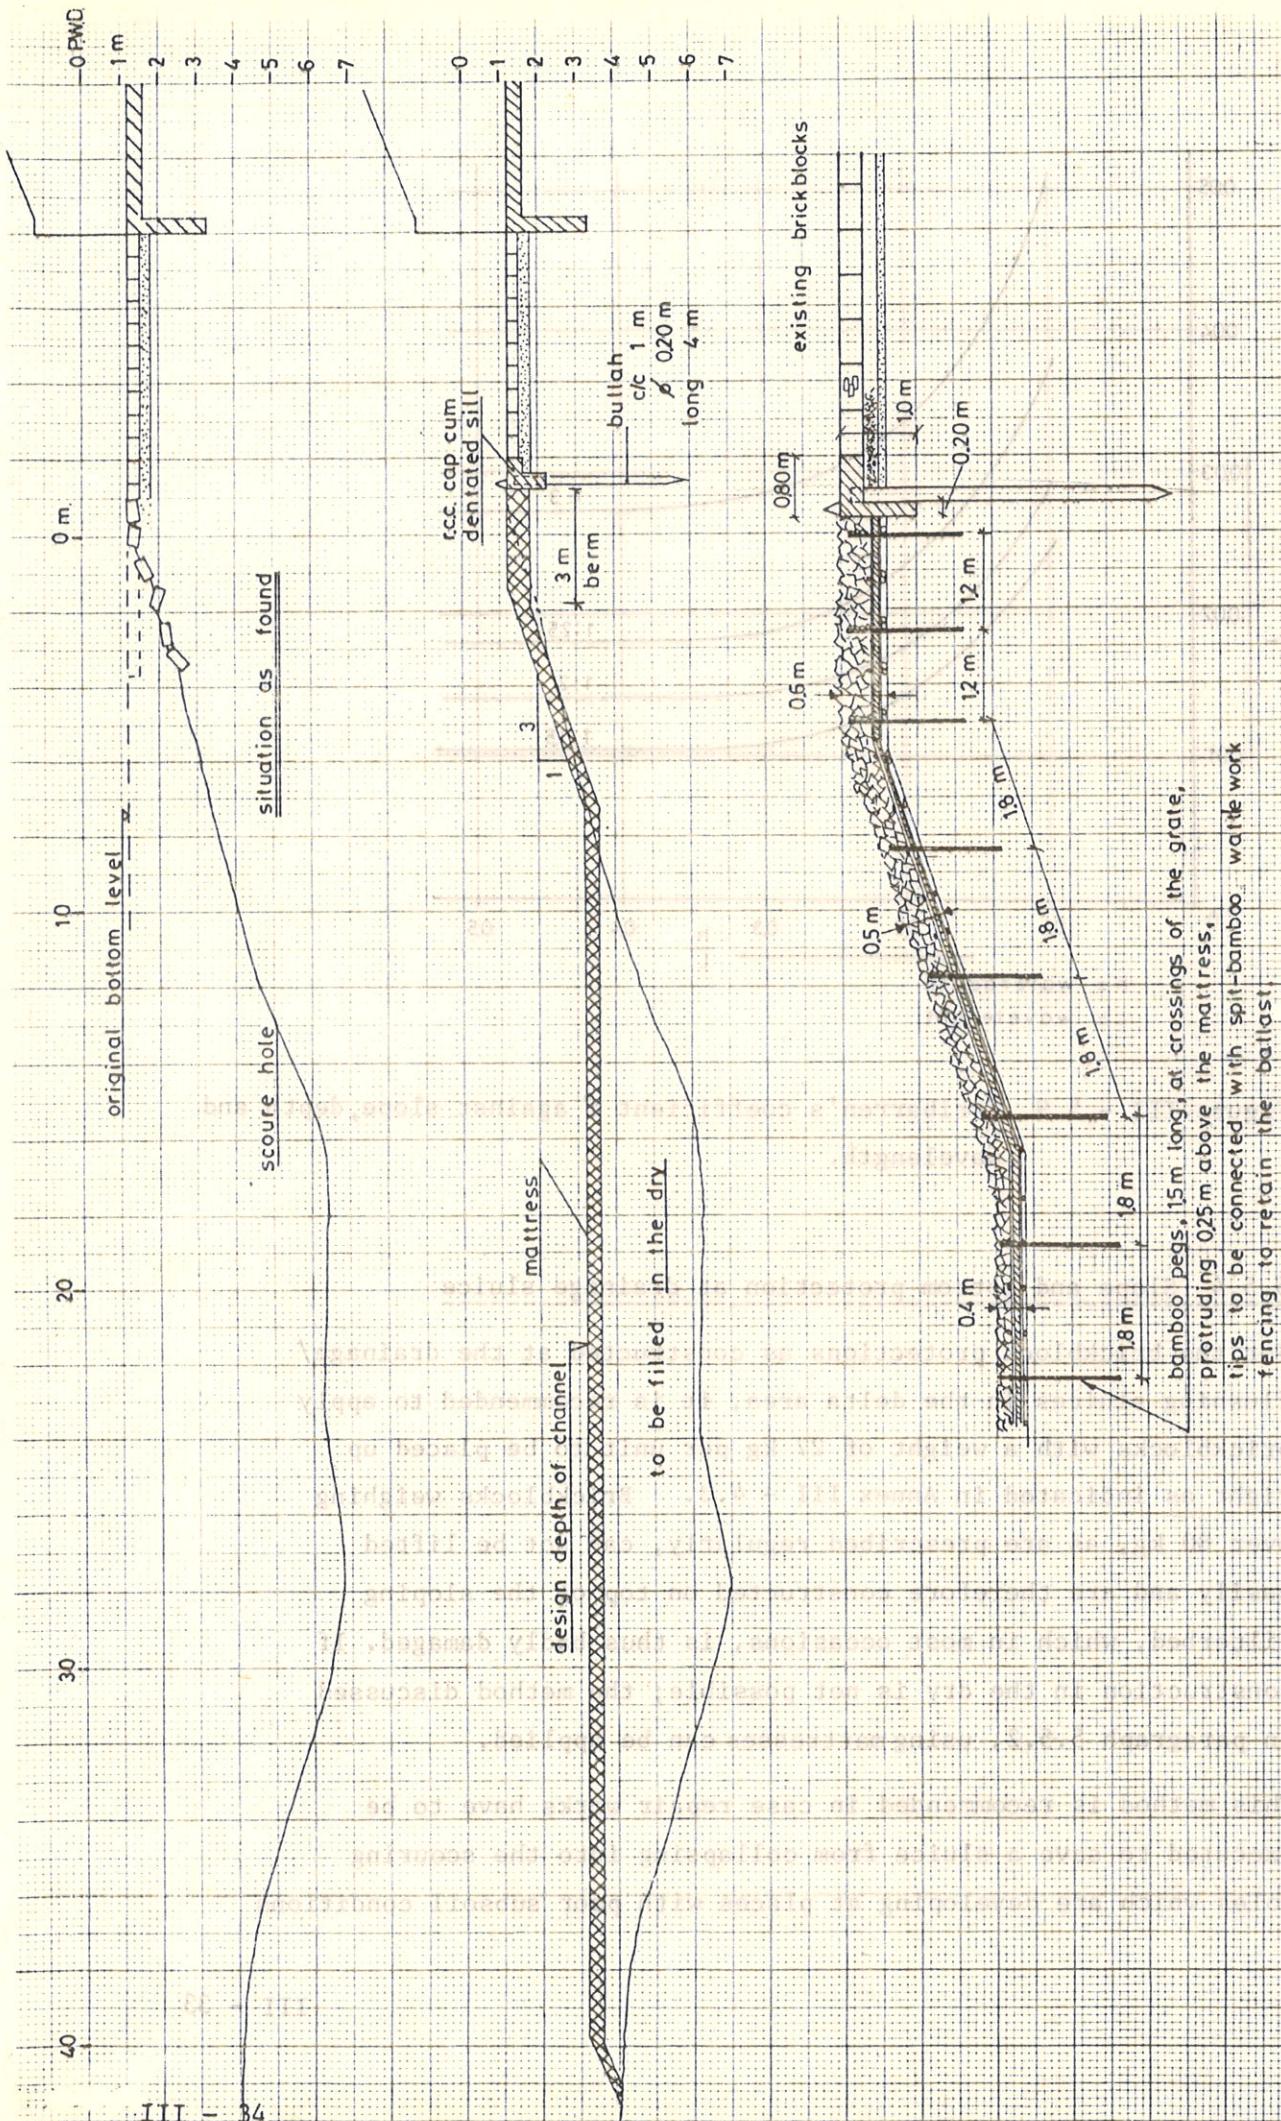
Repair of bottom protection at drainage/inlet sluice.
